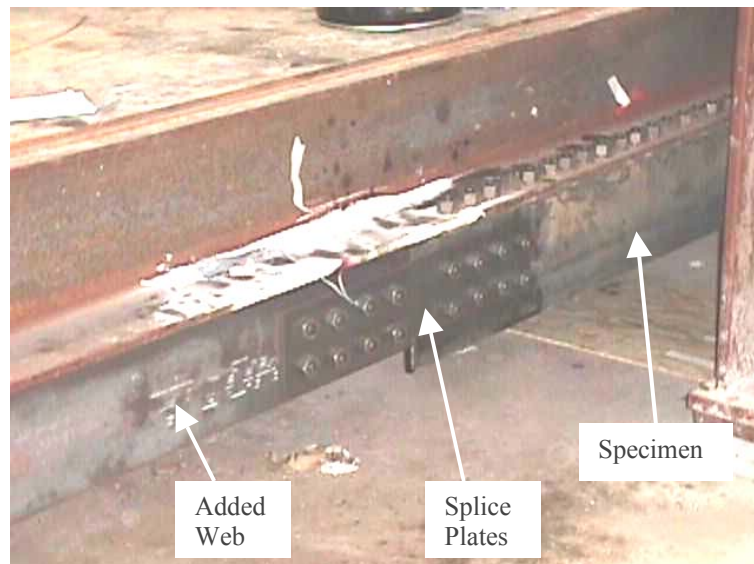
Splice plates bridging the gap between specimen and web mounted below W section.
